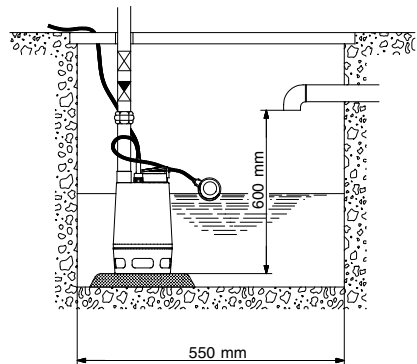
Minimum pit dimensions when the float switch is set to the minimum free cable length
